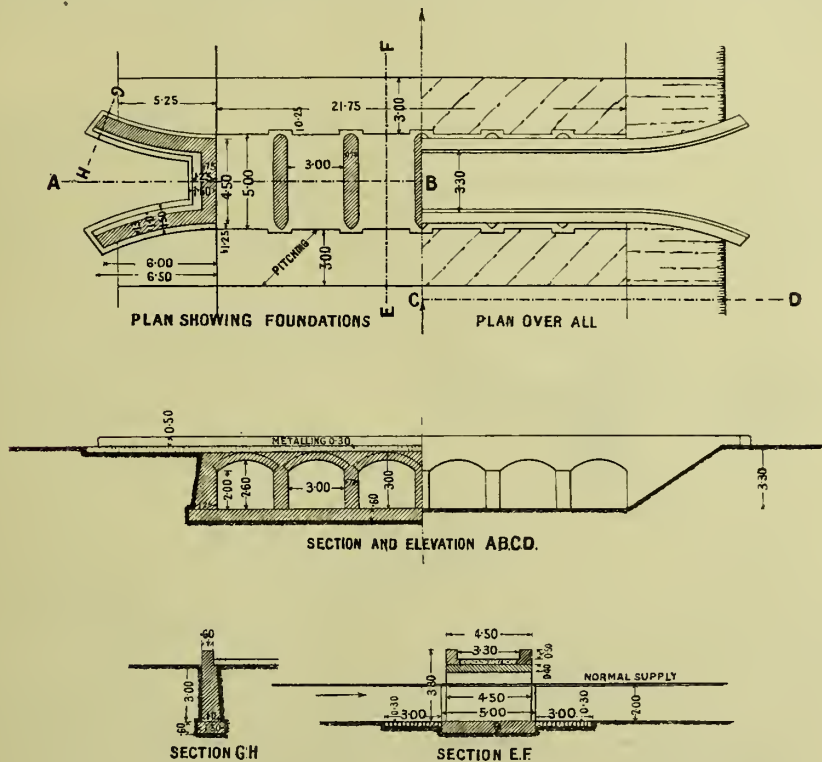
Ordinary Road Bridge for Akkar Kuf Drain. Approx. Scale $\frac{1}{386}$.
